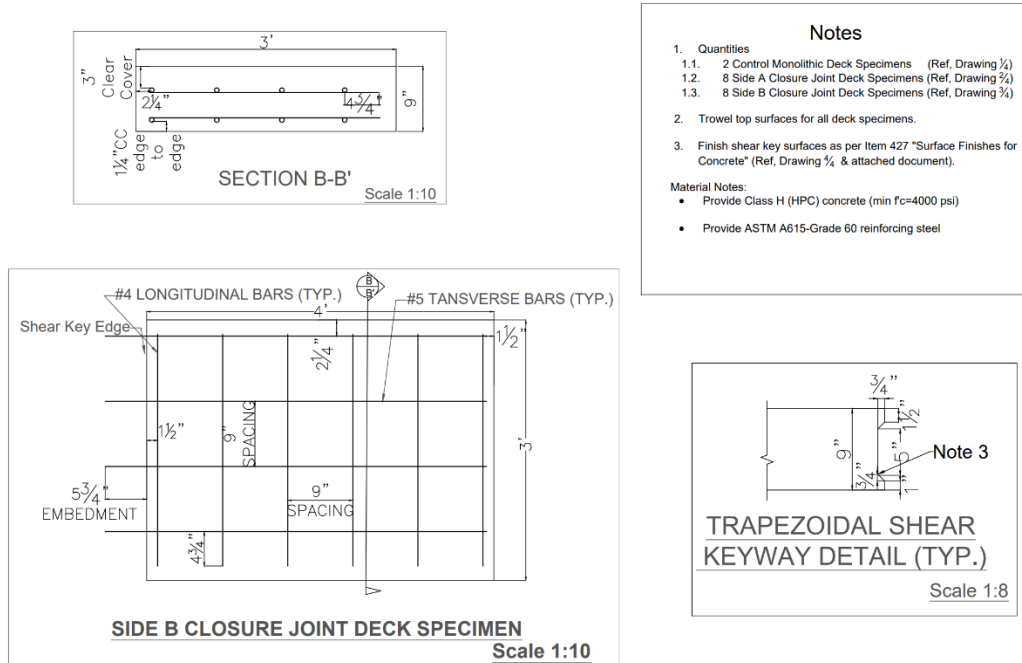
Drawing of Side B Closure Joint Deck Specimen (Scale altered due to formatting)
